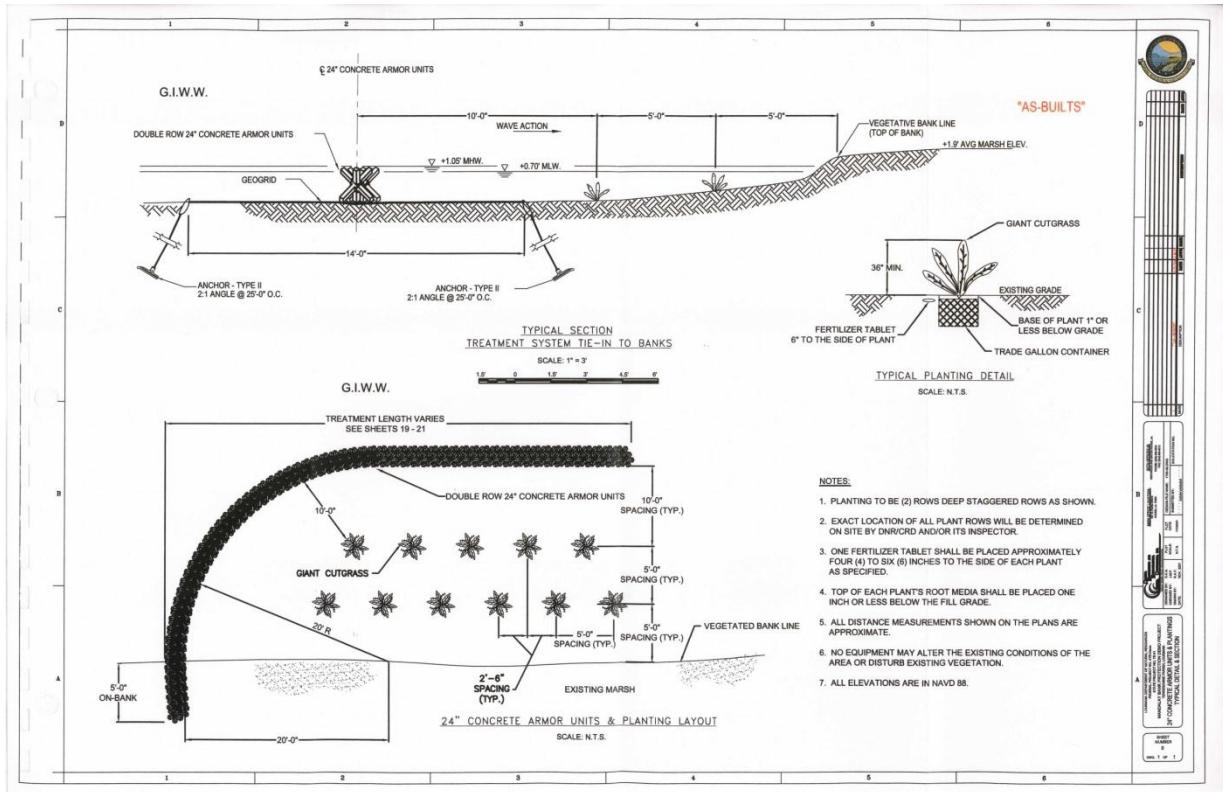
Typical cross section and aerial view depicting the Mandalay Bank Protection Demonstration (TE-41) project's A-Jacks (J) structures.
